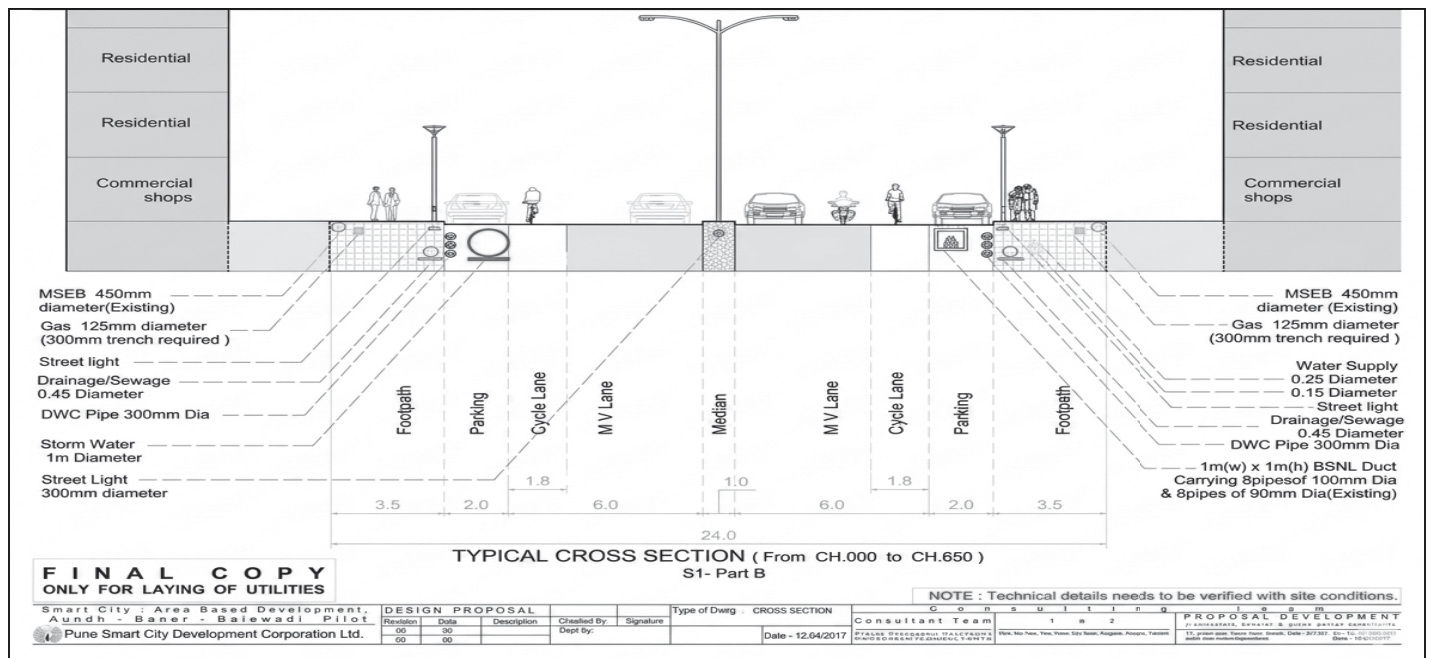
Typical Cross Section for the Urban Street Project with 30 m Wide ROW
